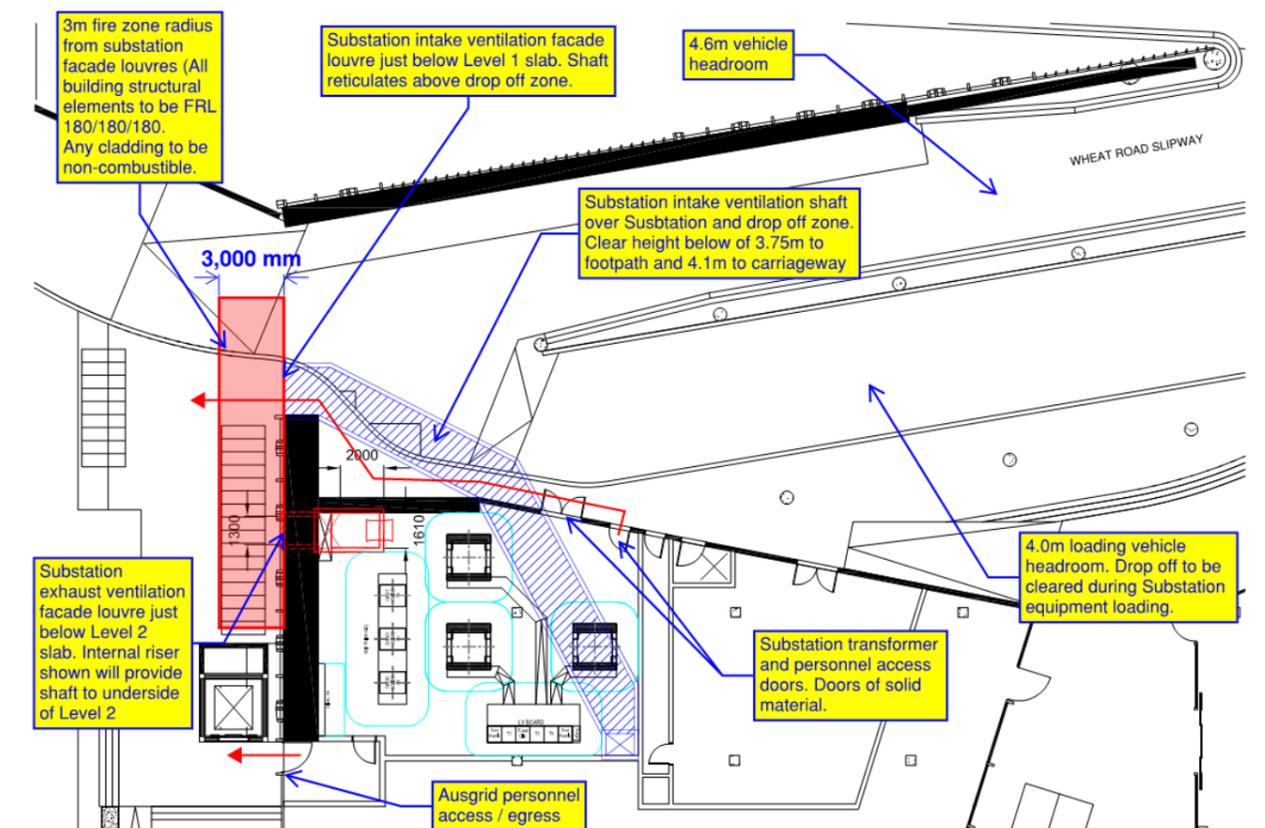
Substation 4 Chamber Location & Spatial Layout, Level 00
